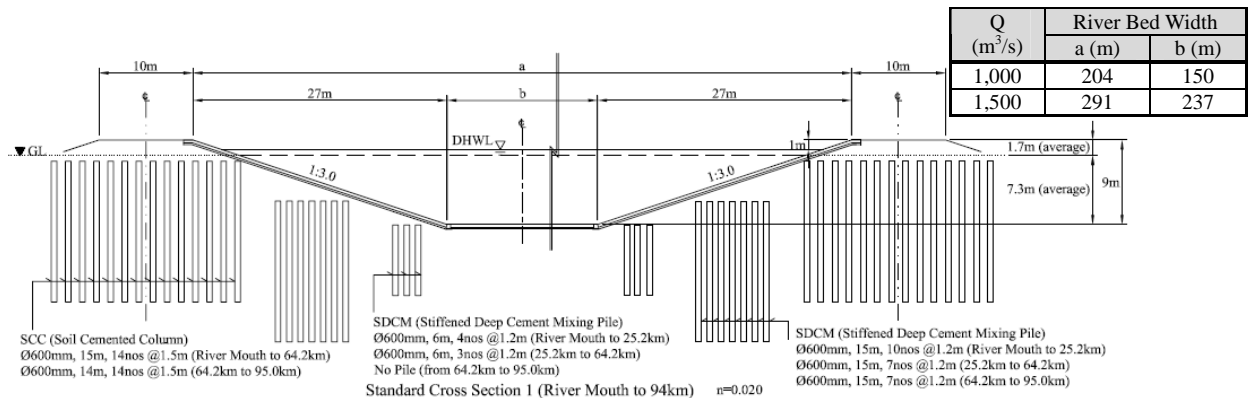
Alternative Cross Section of East Diversion Channel with Slope and Riverbed Protection (0km to 94km)
